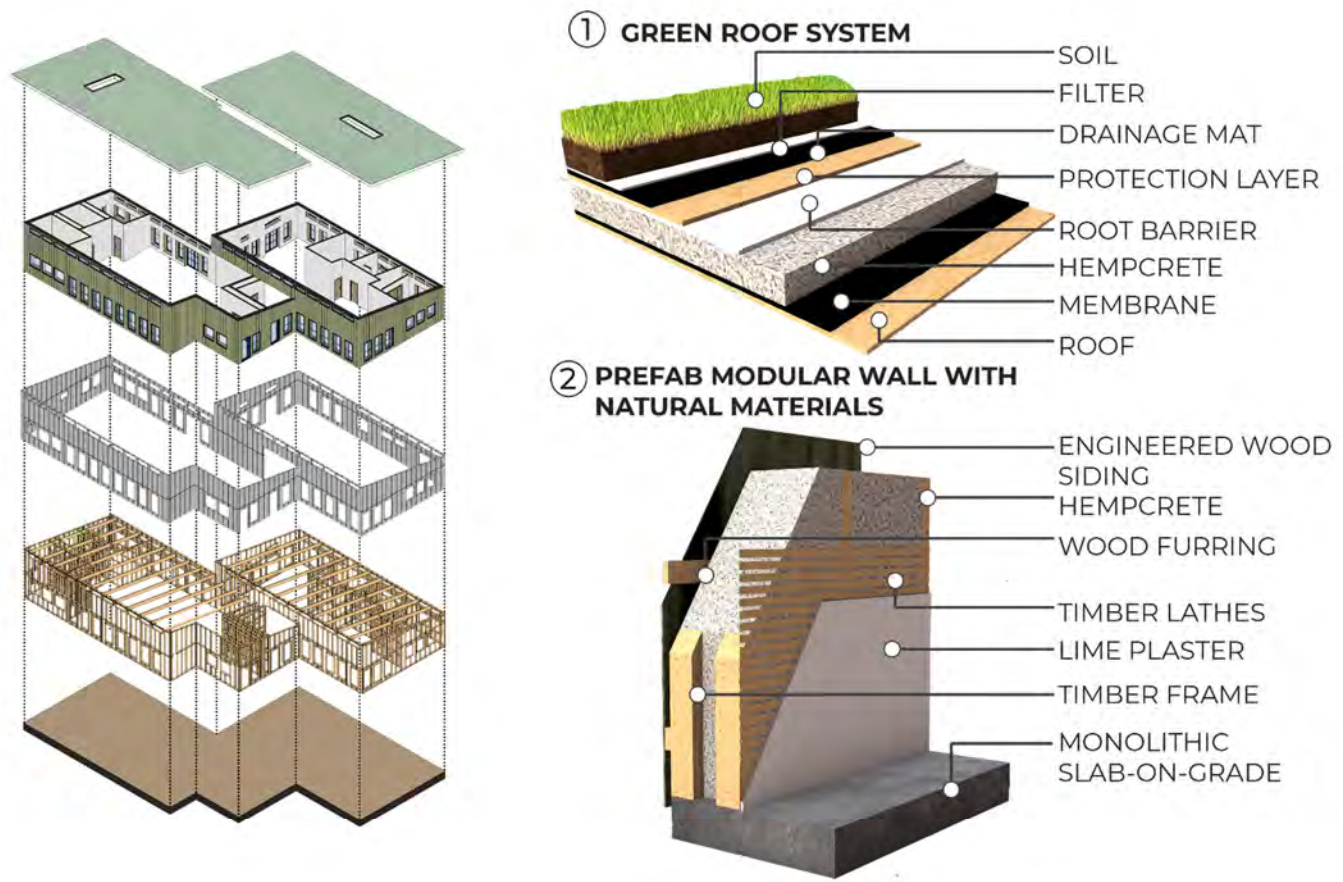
Exploded Axonometric, 3D Roof Detail, and 3D Wall Detail
